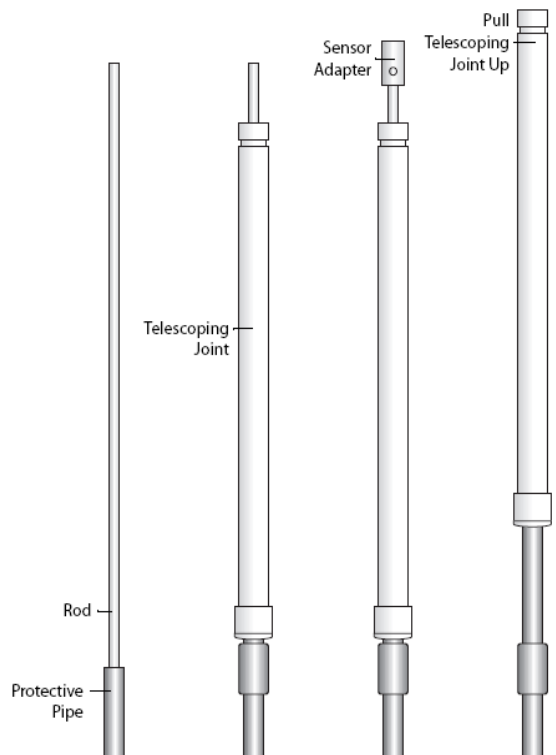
The Procedures in Rod Anchor Assembly (Slope Indicator, 2004).
